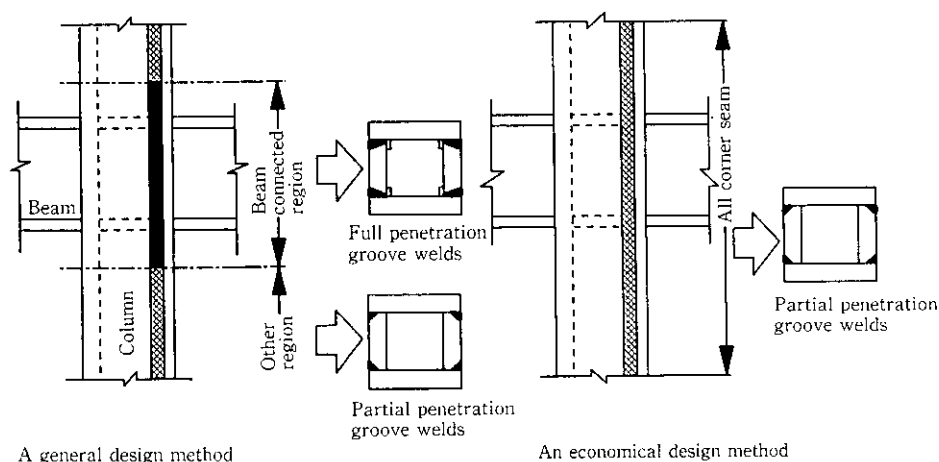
Built-up RHS tube applied to corner seam welds
